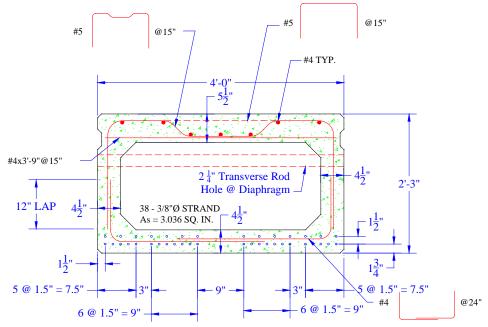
Span 1 Beam 7 of Lakeview Drive Bridge as per Structural Drawings
